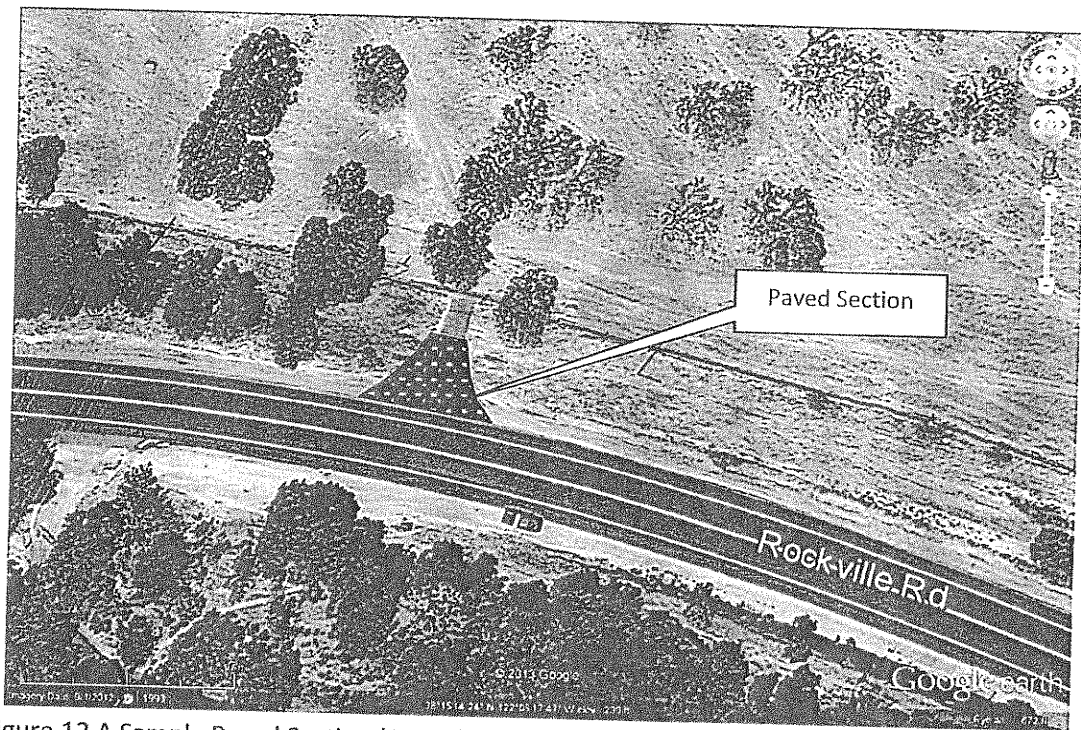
A Sample Paved Section (Apron) at Rockville Road
